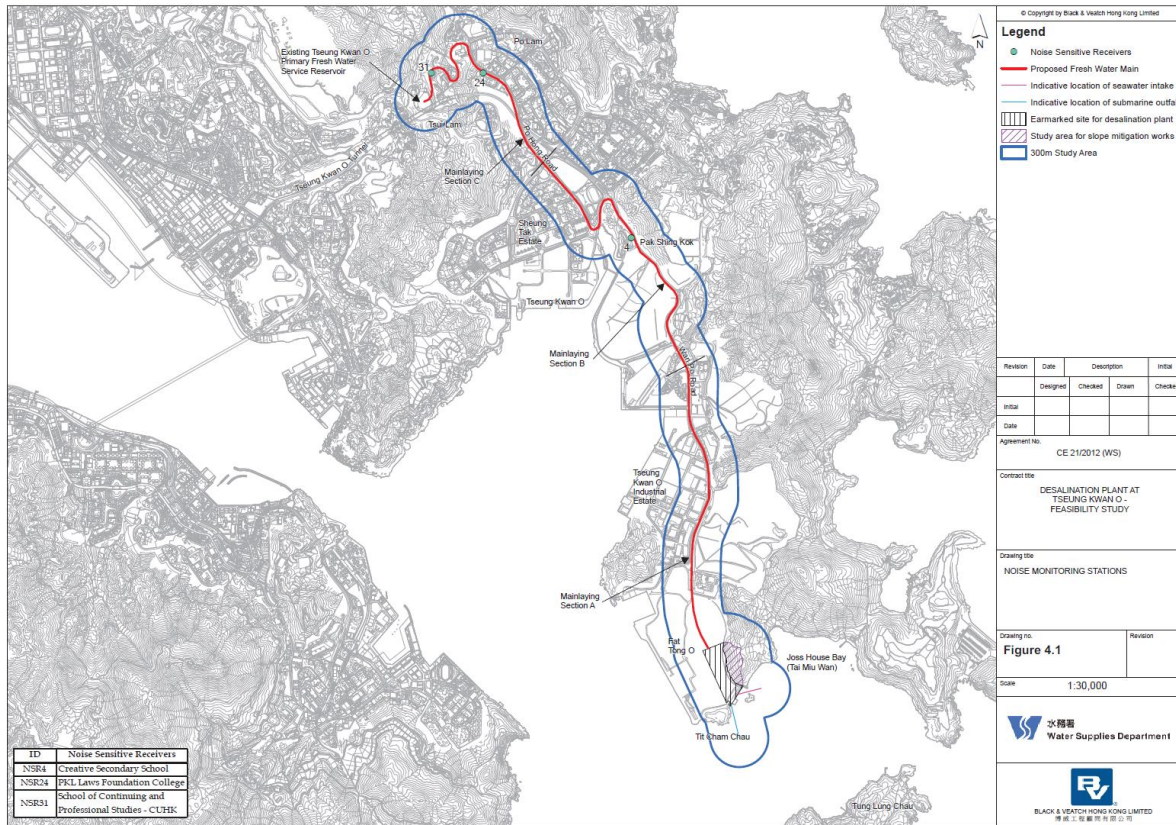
Site Layout Plan with Noise Sensitive Receivers and Desalination Plant
